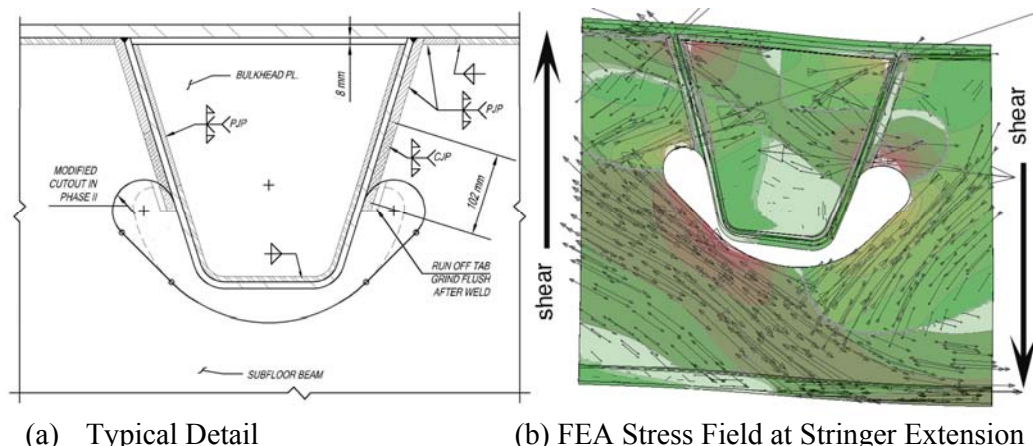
Rib to Floor Beam Connection in Replacement Orthotropic Deck for Verrazano Narrows Bridge
